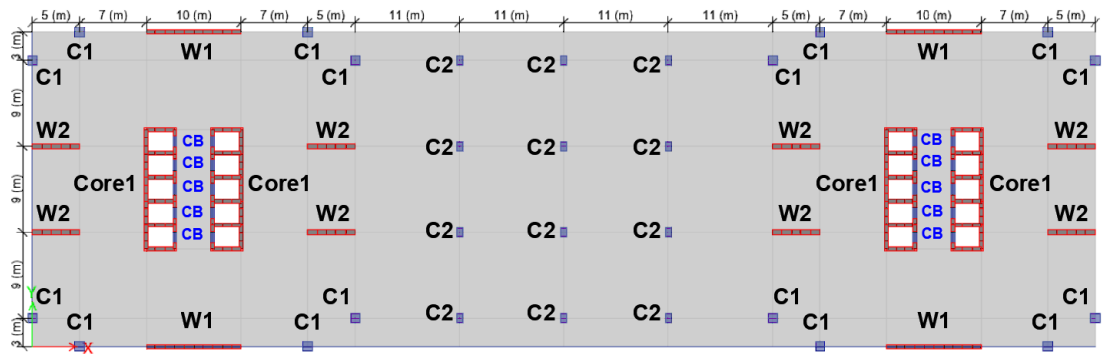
Podium floor plans (1<sup>st</sup> to 9<sup>th</sup> floor).
